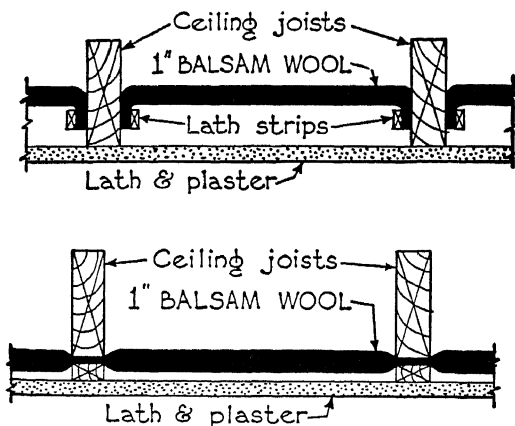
Sections of Ceilings Showing Application of Quilt or Blanket Type of Insulation
